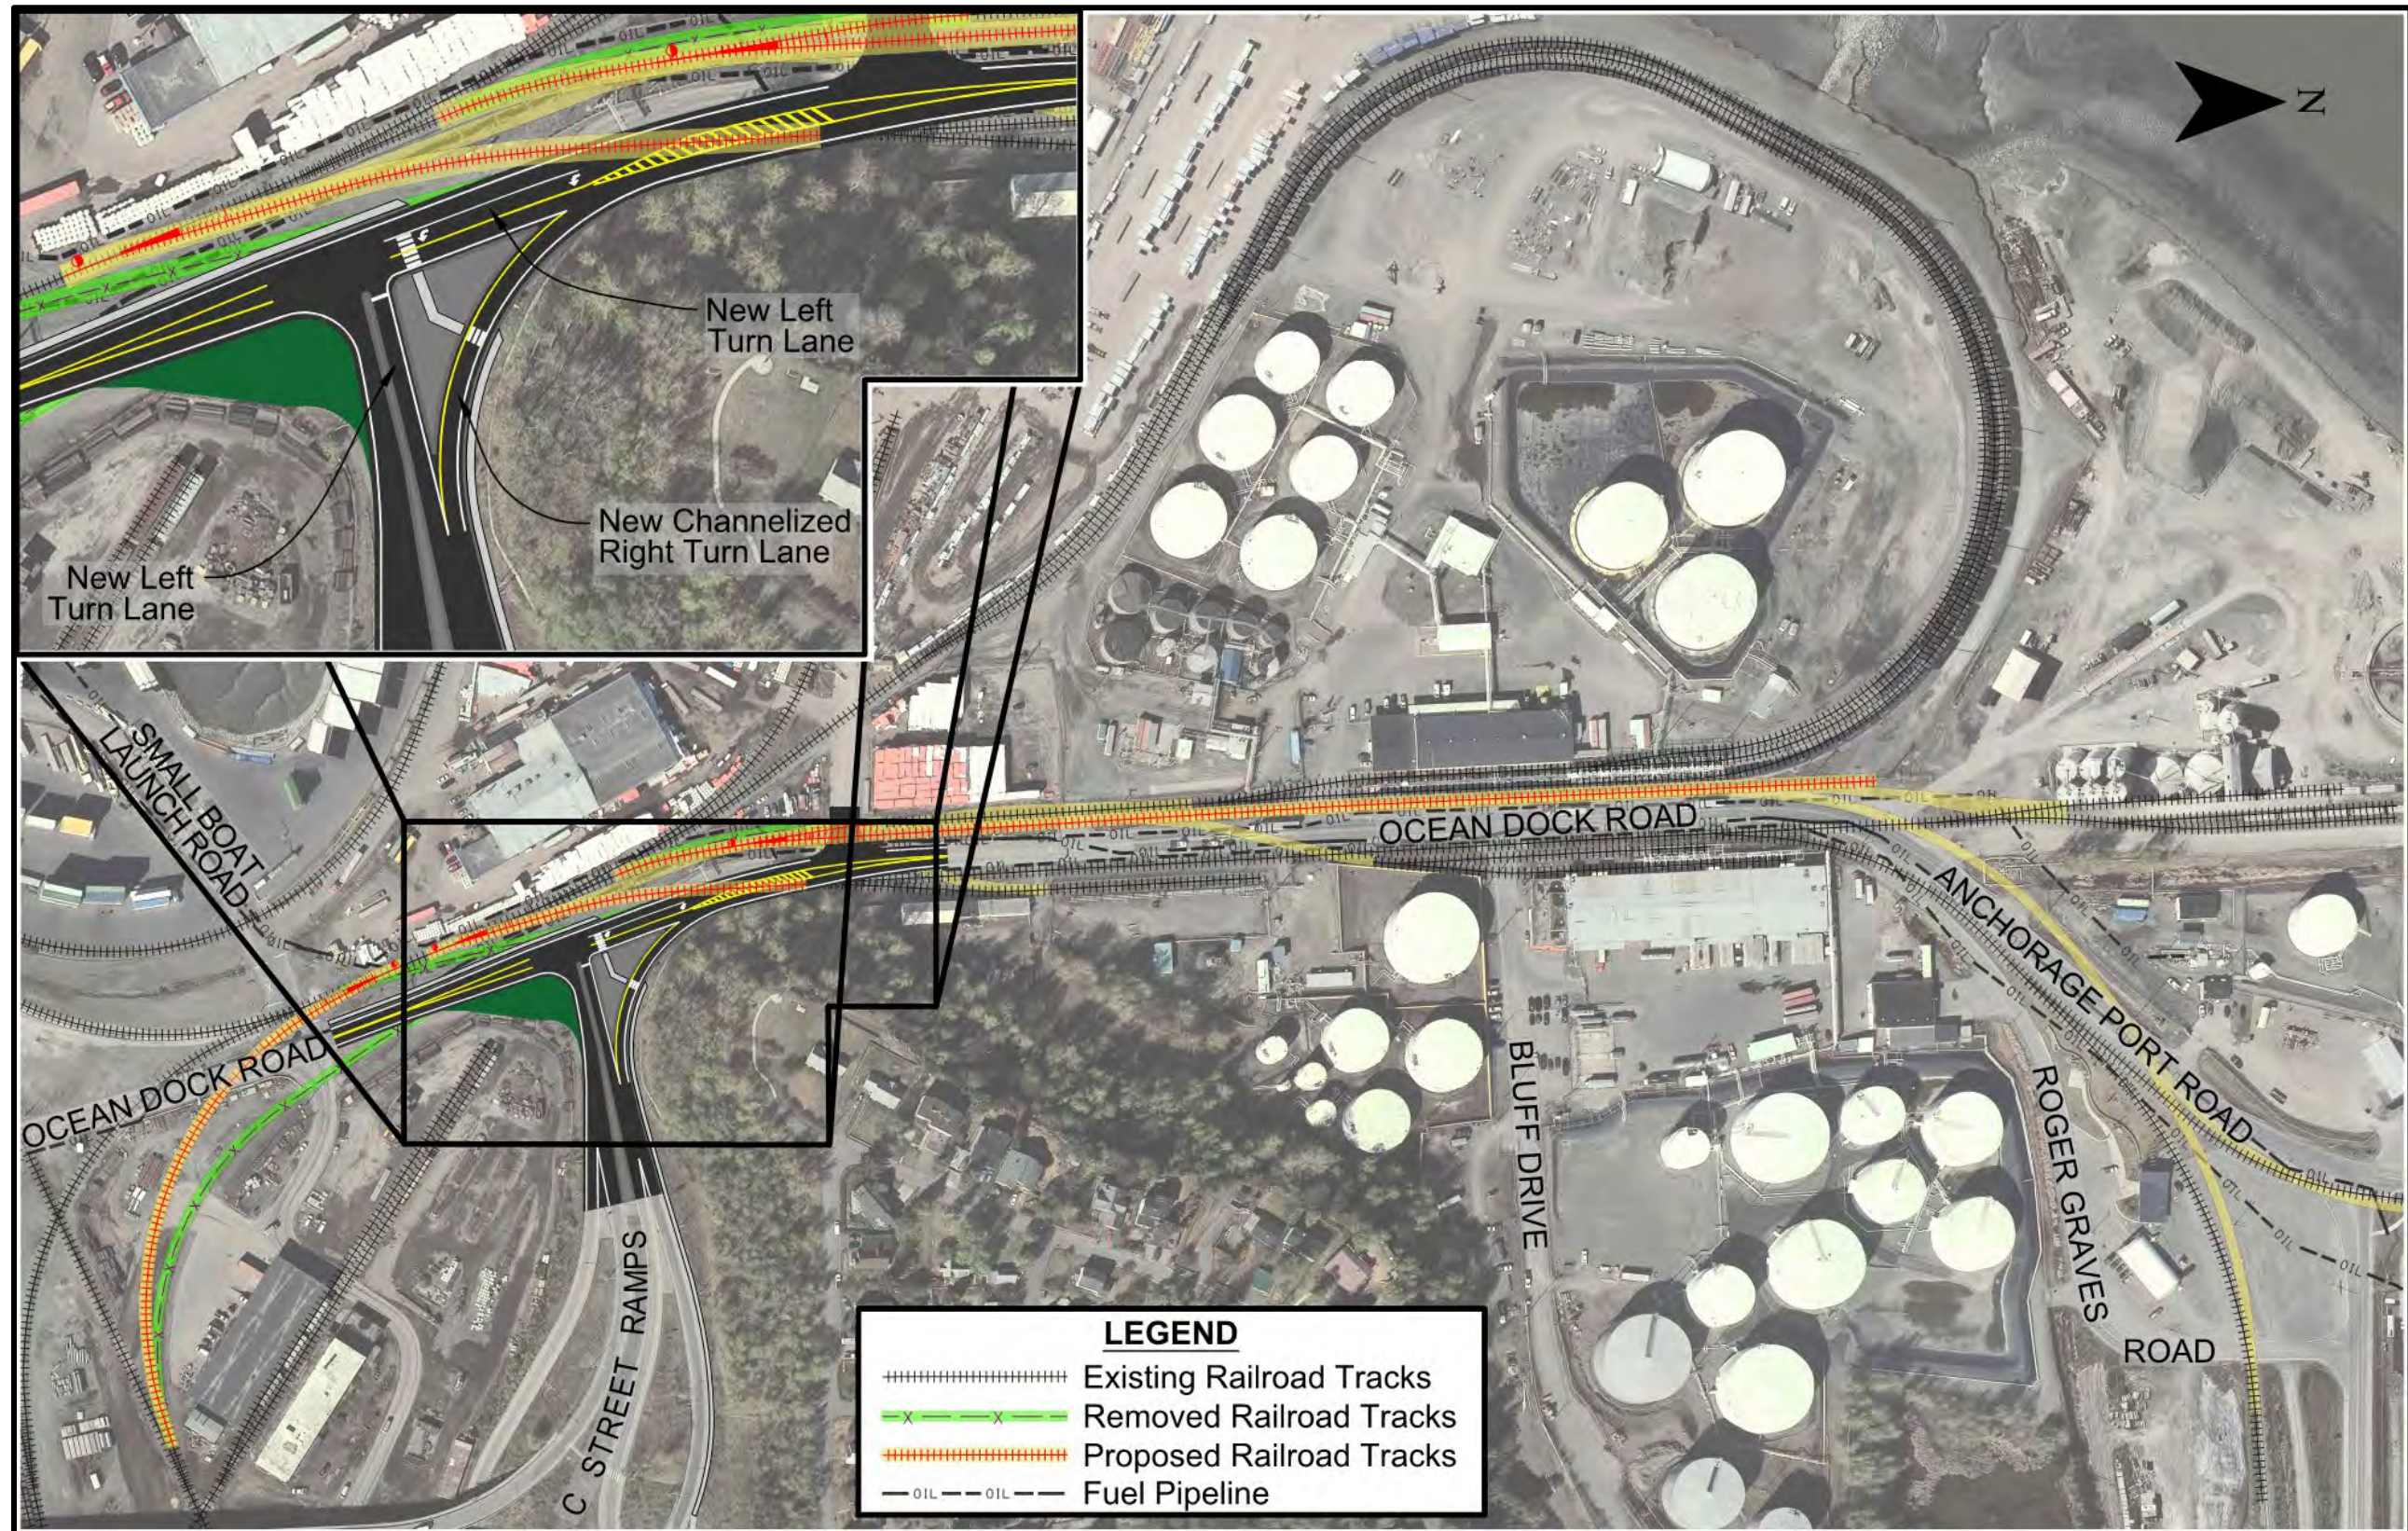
Road Concept B (Realigned T Intersection) with Rail Concept 3
